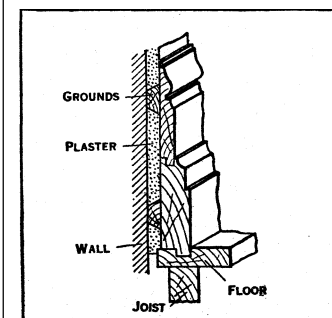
BUILT-UP SKIRTING TONGUED TO FLOOR
